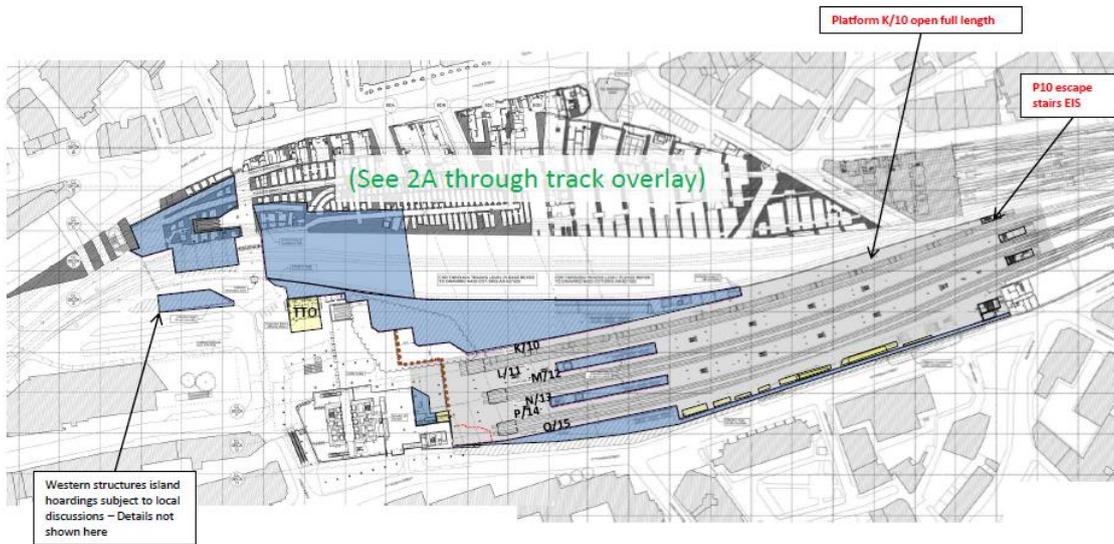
London Bridge Station Redevelopment – Cross Section at Stage 2A (Rev 6)
